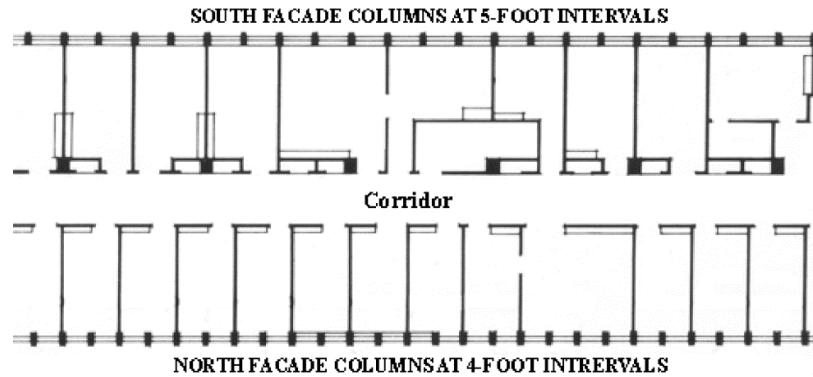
Menzies construction, Monash University, parts of type plane of floors [5]
